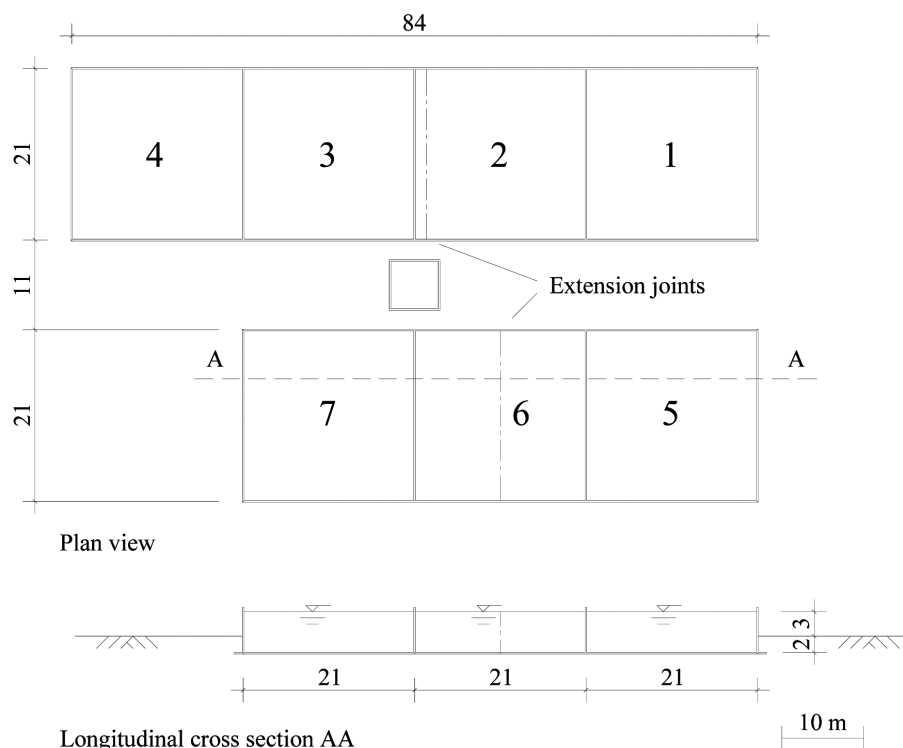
PLAN VIEW AND LONGITUDINAL CROSS-SECTION OF THE TWO SEWAGE TANKS AT CIC-STP (DIMENSIONS IN METERS)
